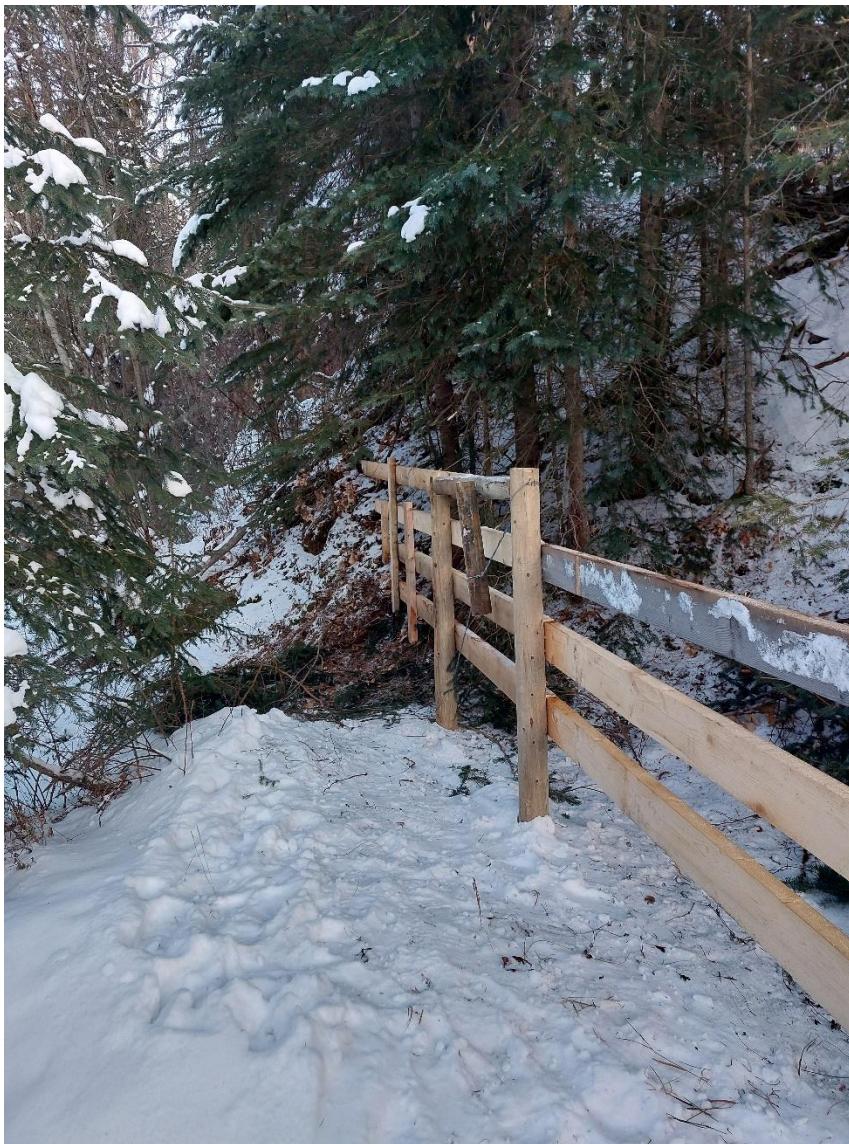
Wooden rail fence and crossing at Richfield Creek (Right)
